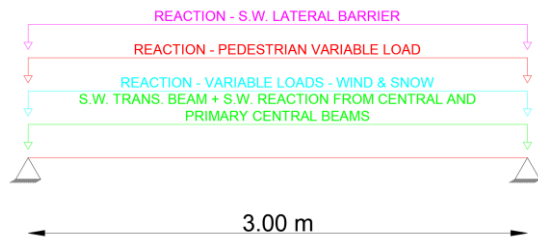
Static Scheme Description – Transversal Beams – Connection Deck-Arches - Geometry and Applied Loads
